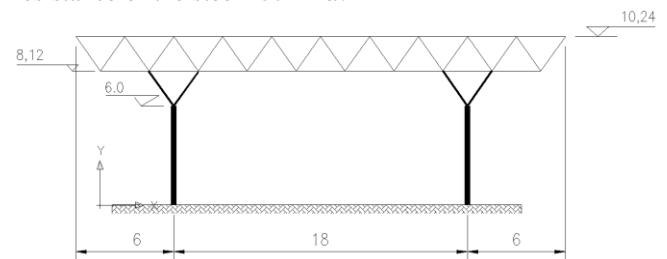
Geometrical dimensions of the structural construction C.1 in the vertical section
